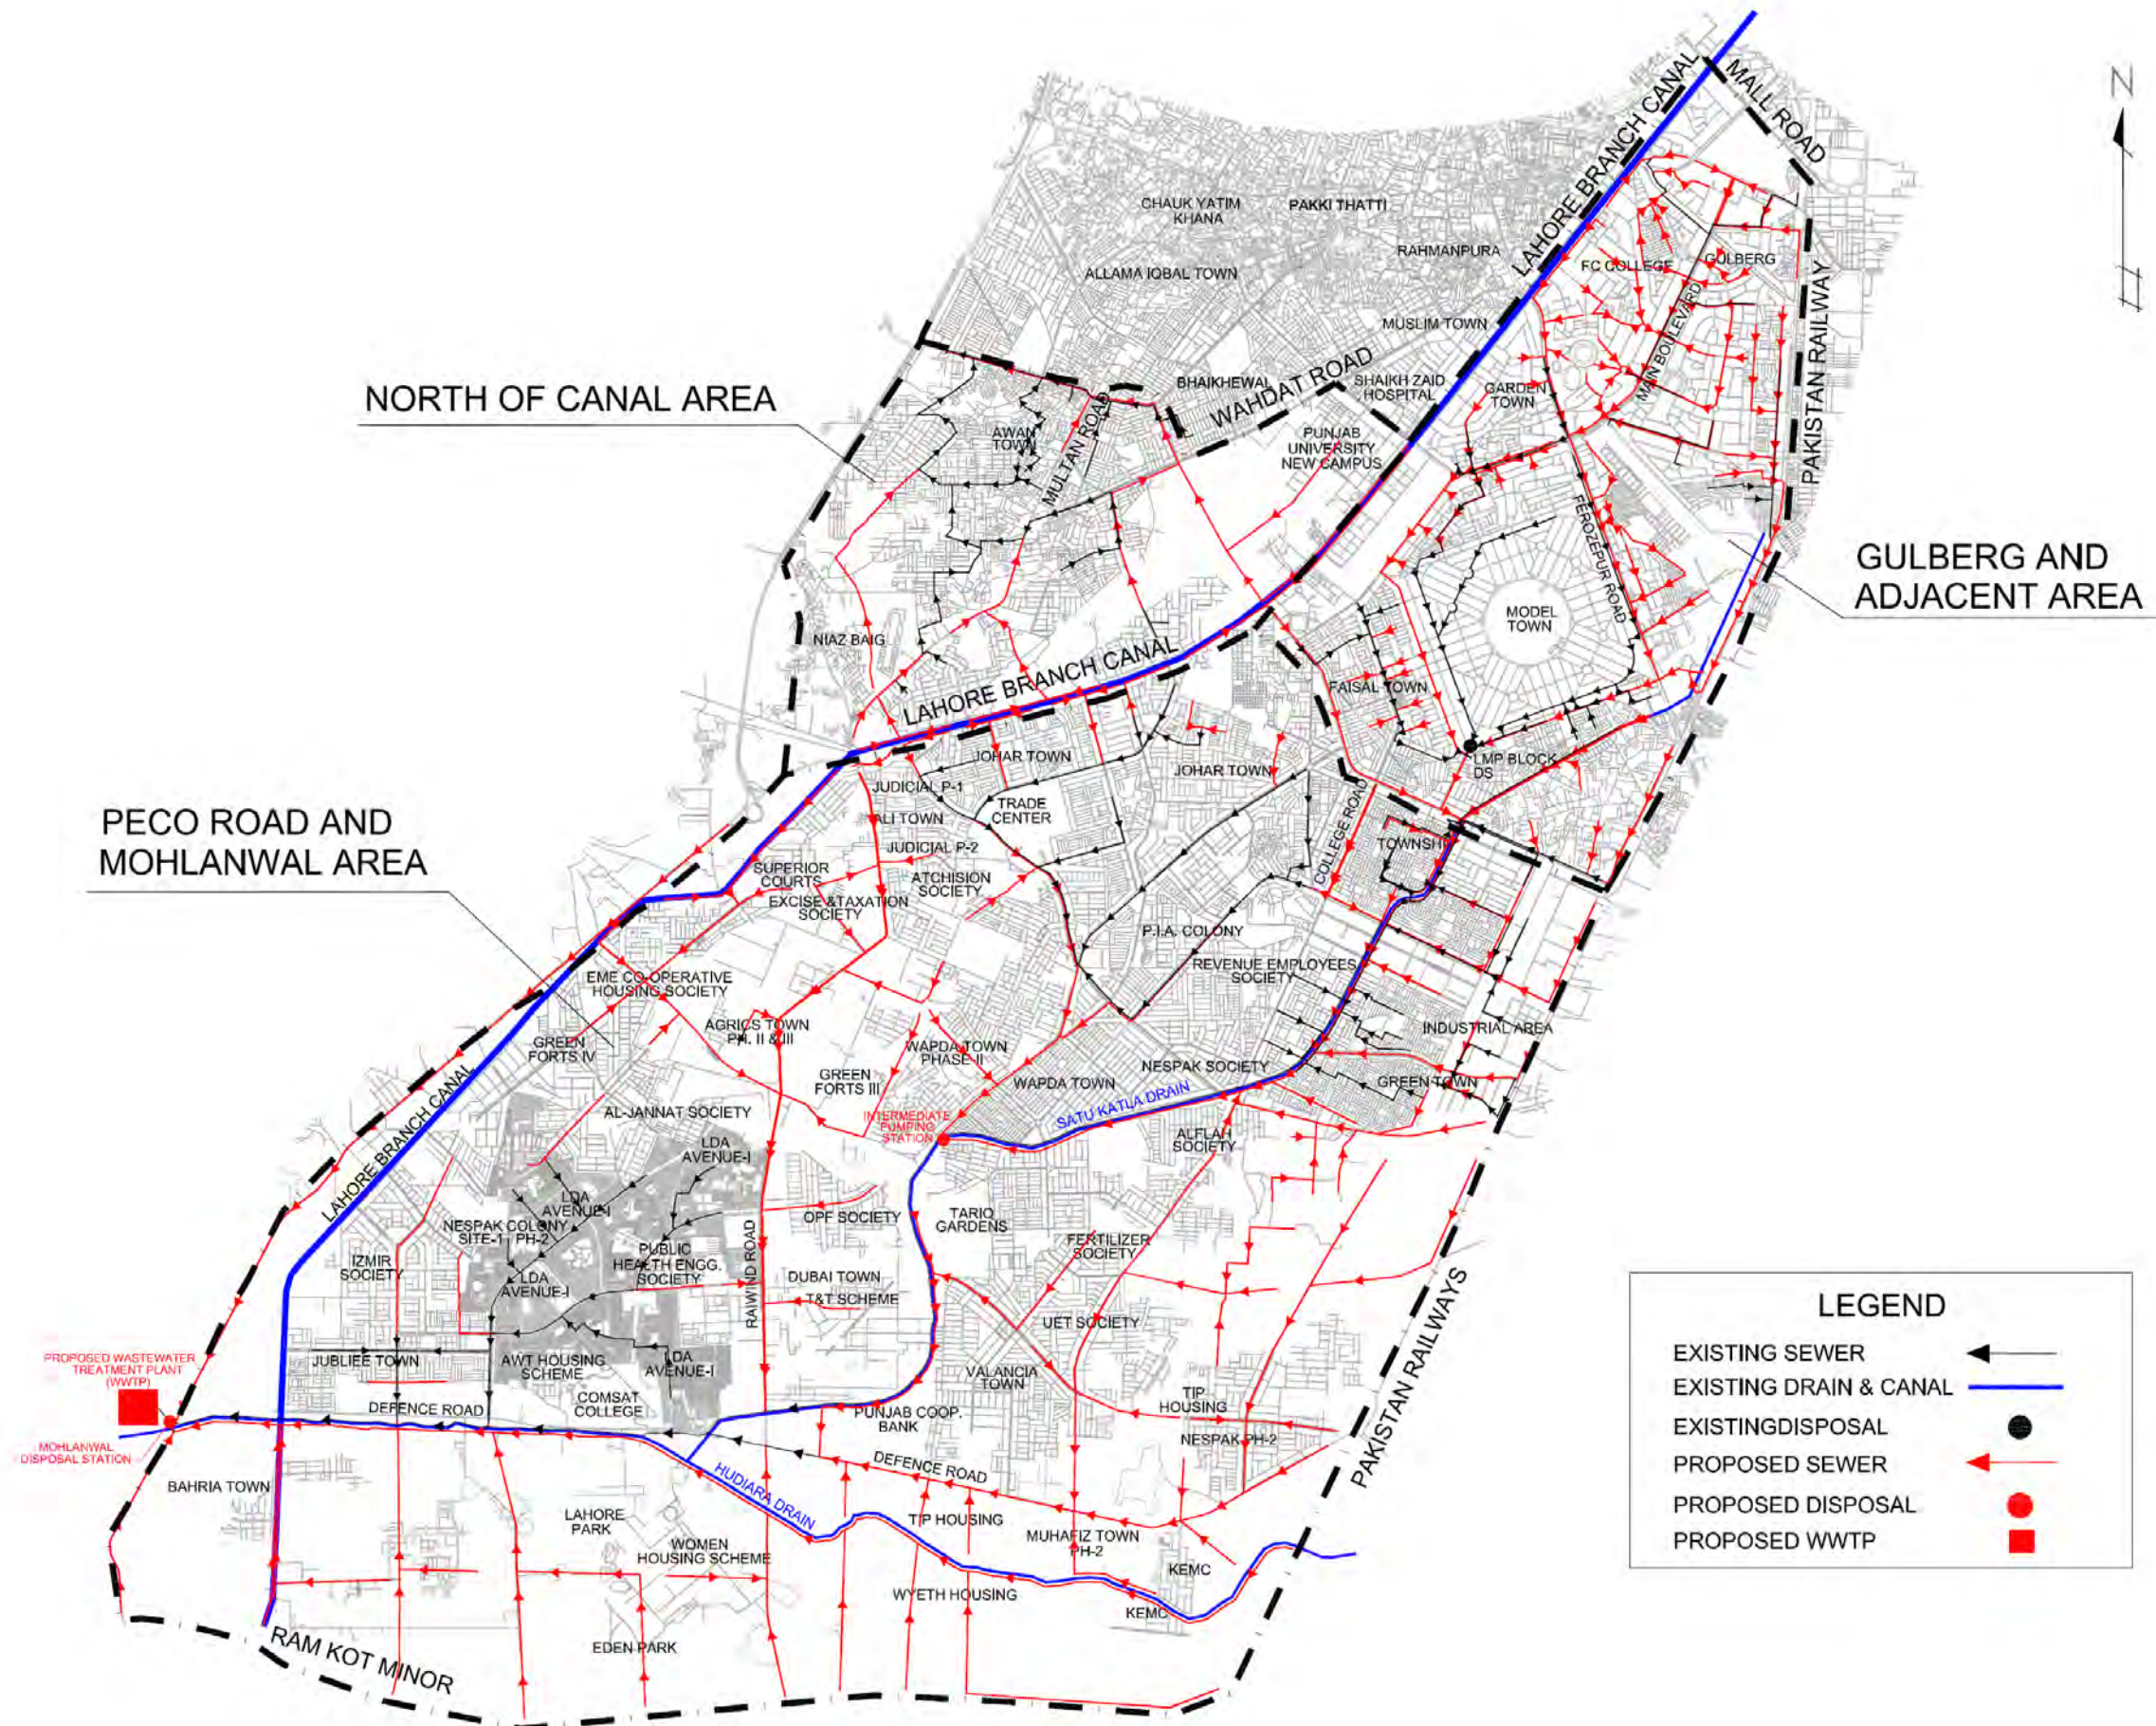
Plan of Proposed Sewerage Facilities of Phase 2 Project
